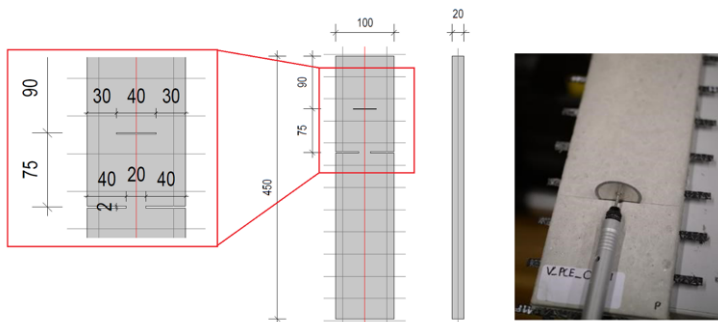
Pull-out specimens geometry and performing the middle saw cut
